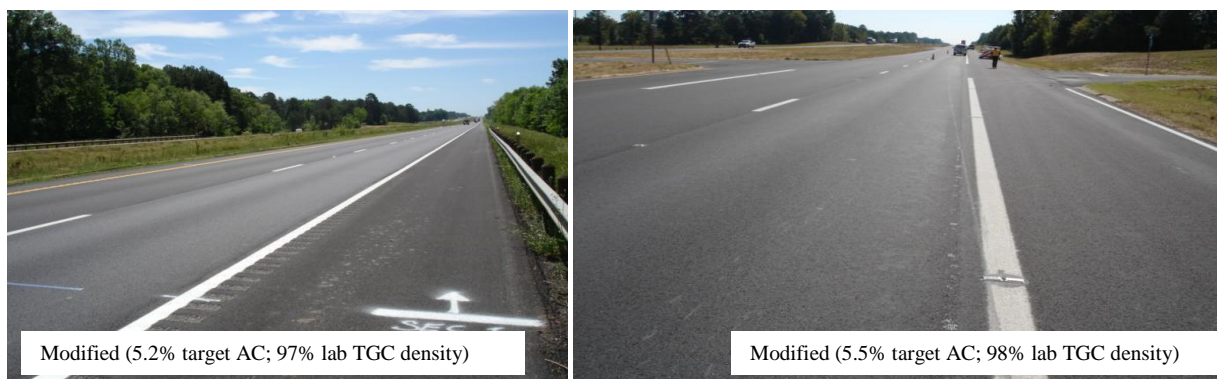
View of the Test Sections – No Visible Surface Rutting.
